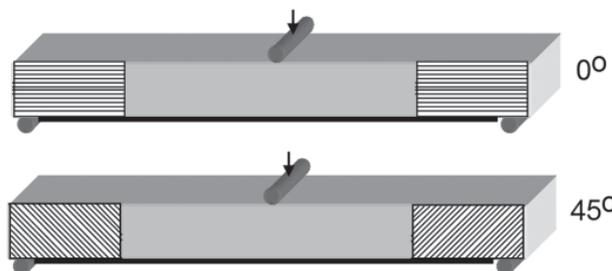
Beams with glued laminate 1D and laminate 1D with orientation of fibres 0° and 45° reinforcement.
